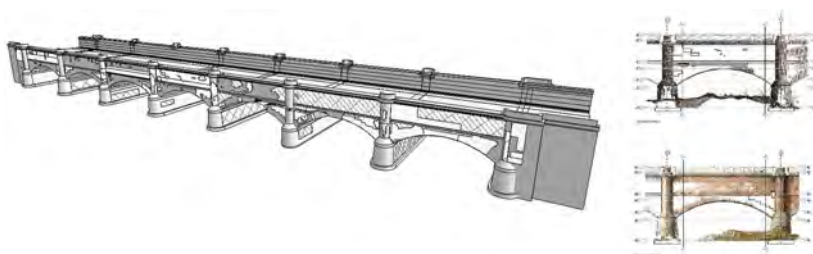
B.I.M. for the detailed bridge inspection.
